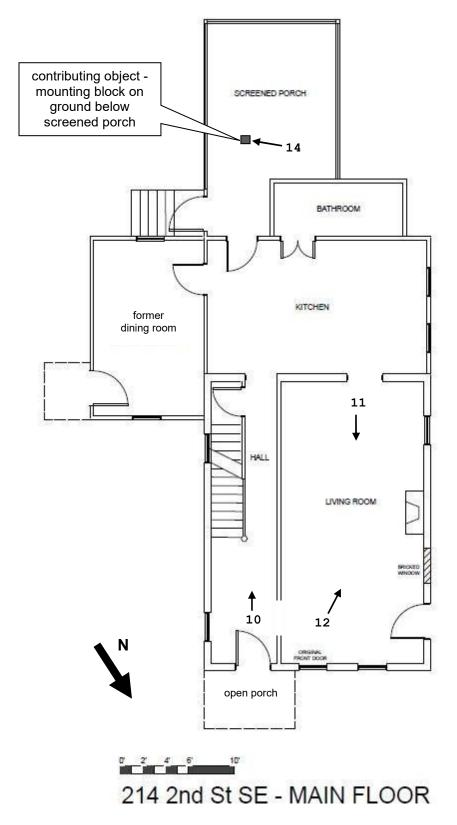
Main Floor Plan showing direction of photographs #10-11 and 14 Drawn by Ed Sauter, Mount Vernon, Iowa
